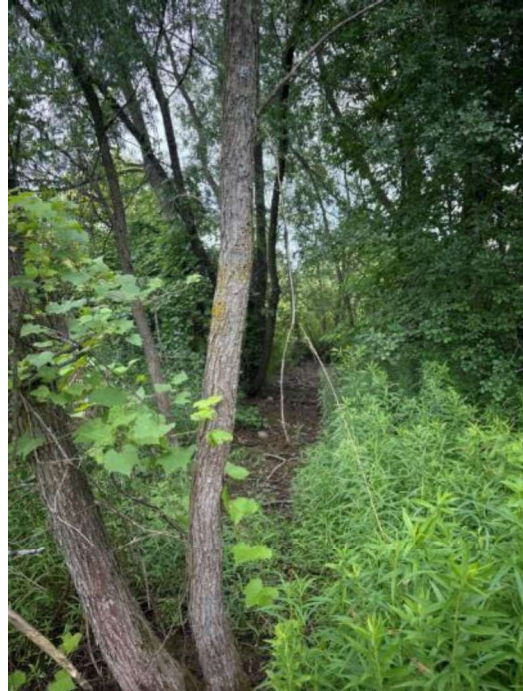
Hearthwood SWM Infiltration Trench - Four Large Crack Willows Rooted in Gabion; Flow Path Around the Spreader
